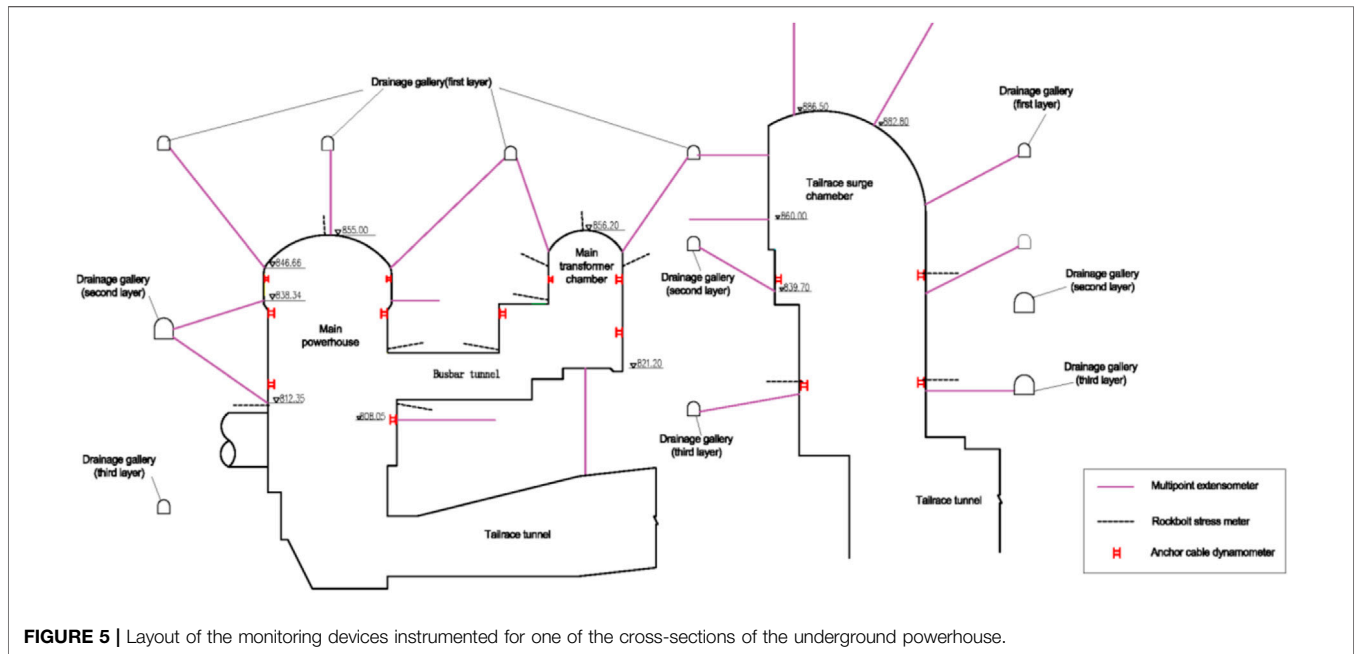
| Layout of the monitoring devices instrumented for one of the cross-sections of the underground powerhouse.
